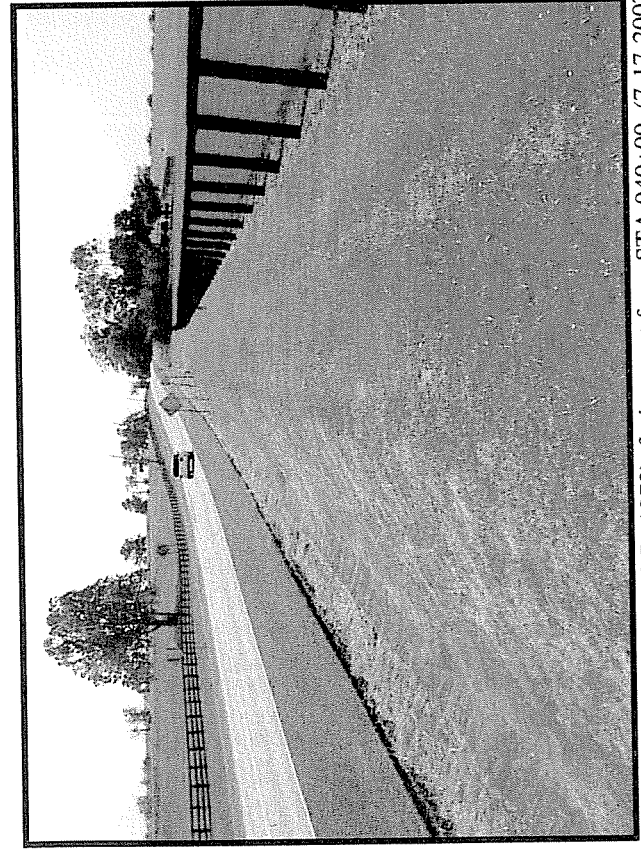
Segment 10 (S.R. 1973), facing west from STA 940+00. (7-17-2007)
